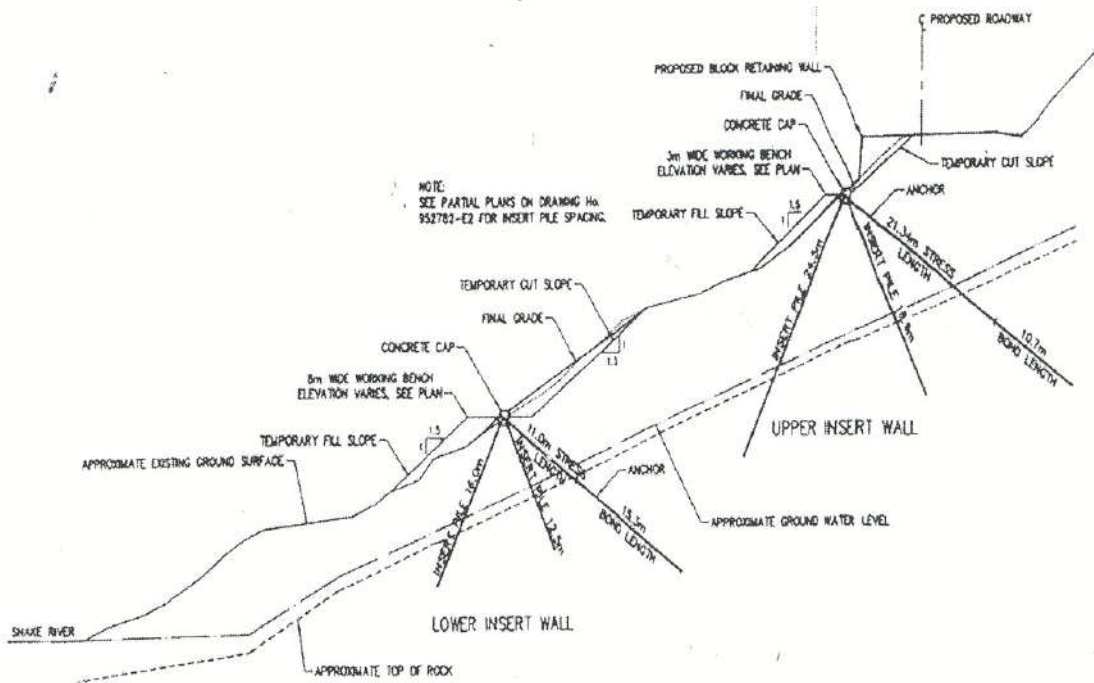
Typical Section of Micropile and Ground Anchor Wall for Blue Trail Landslide Project (after Hasenkamp, 1999).
